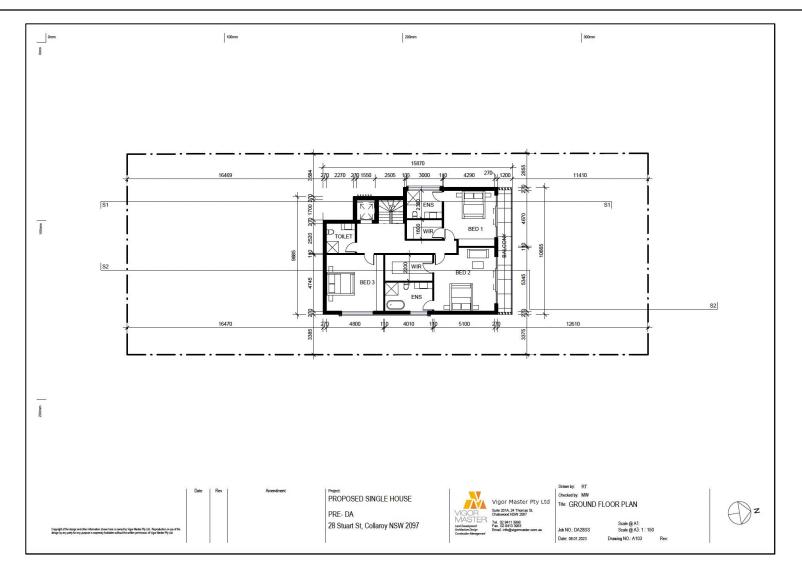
ILLUSTRATES PROPOSED GROUND FLOOR PLAN
